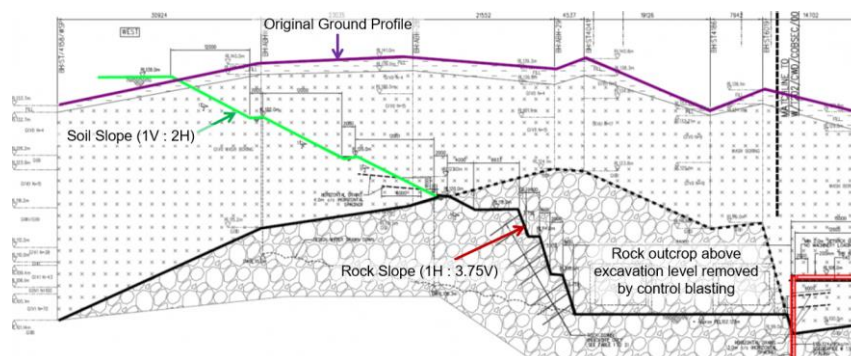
Typical Cross Section View of a Rock Slope below Soil Slope Sections
